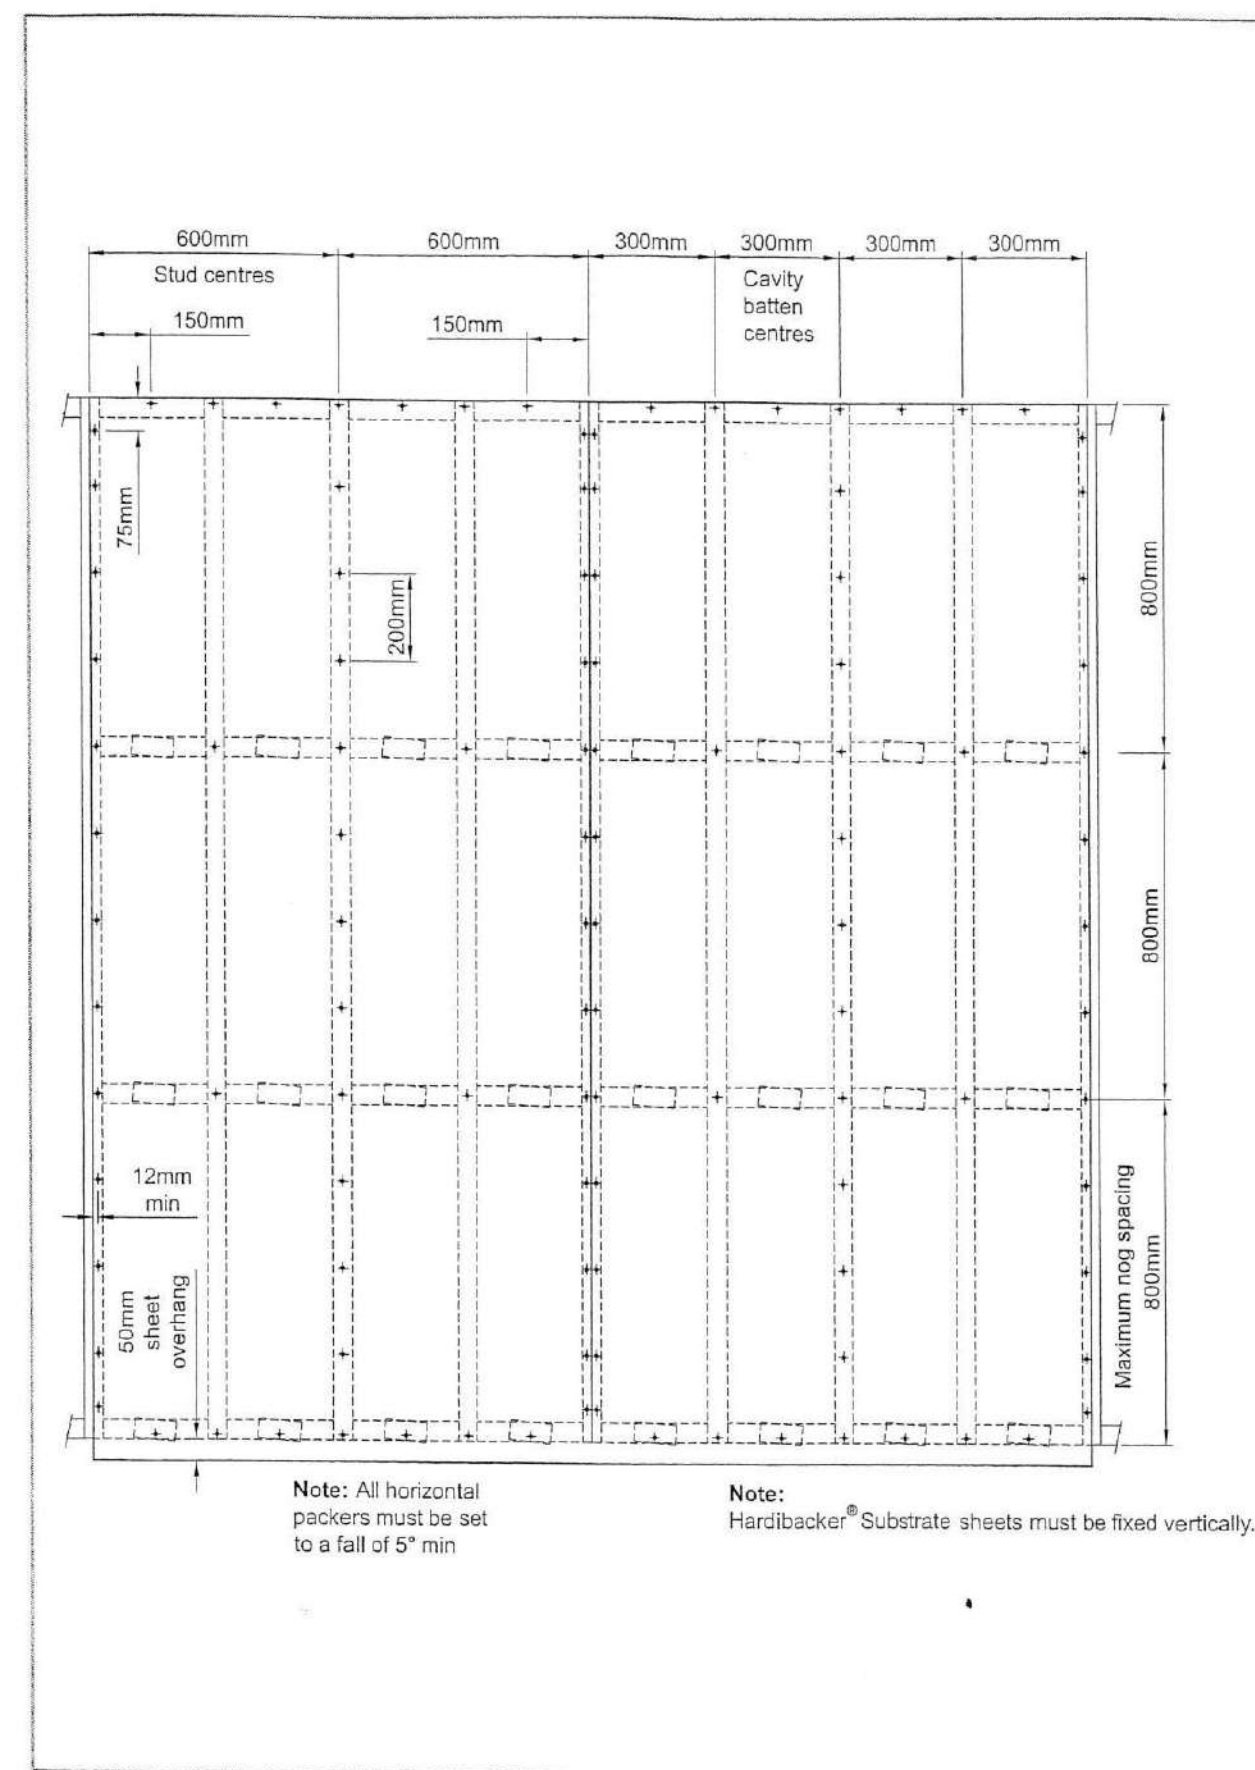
TYPICAL SHEET FIXING SETOUT
